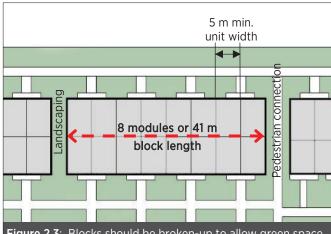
Blocks should be broken-up to allow green space and pedestrian connections
